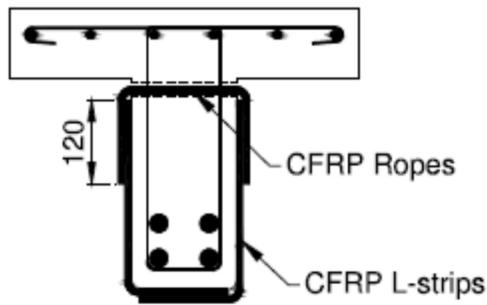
CFRP rope anchorage system used in conjunction with two L-shaped CFRP sheets [92]
